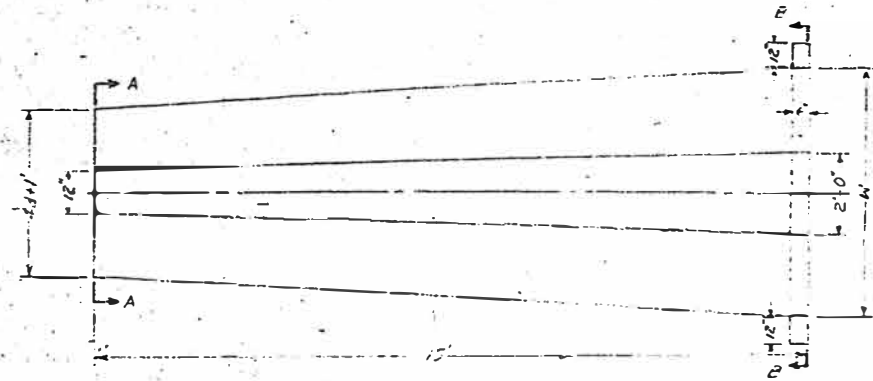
DETAIL OF ANCHOR WALL FOR PAVED DITCH
